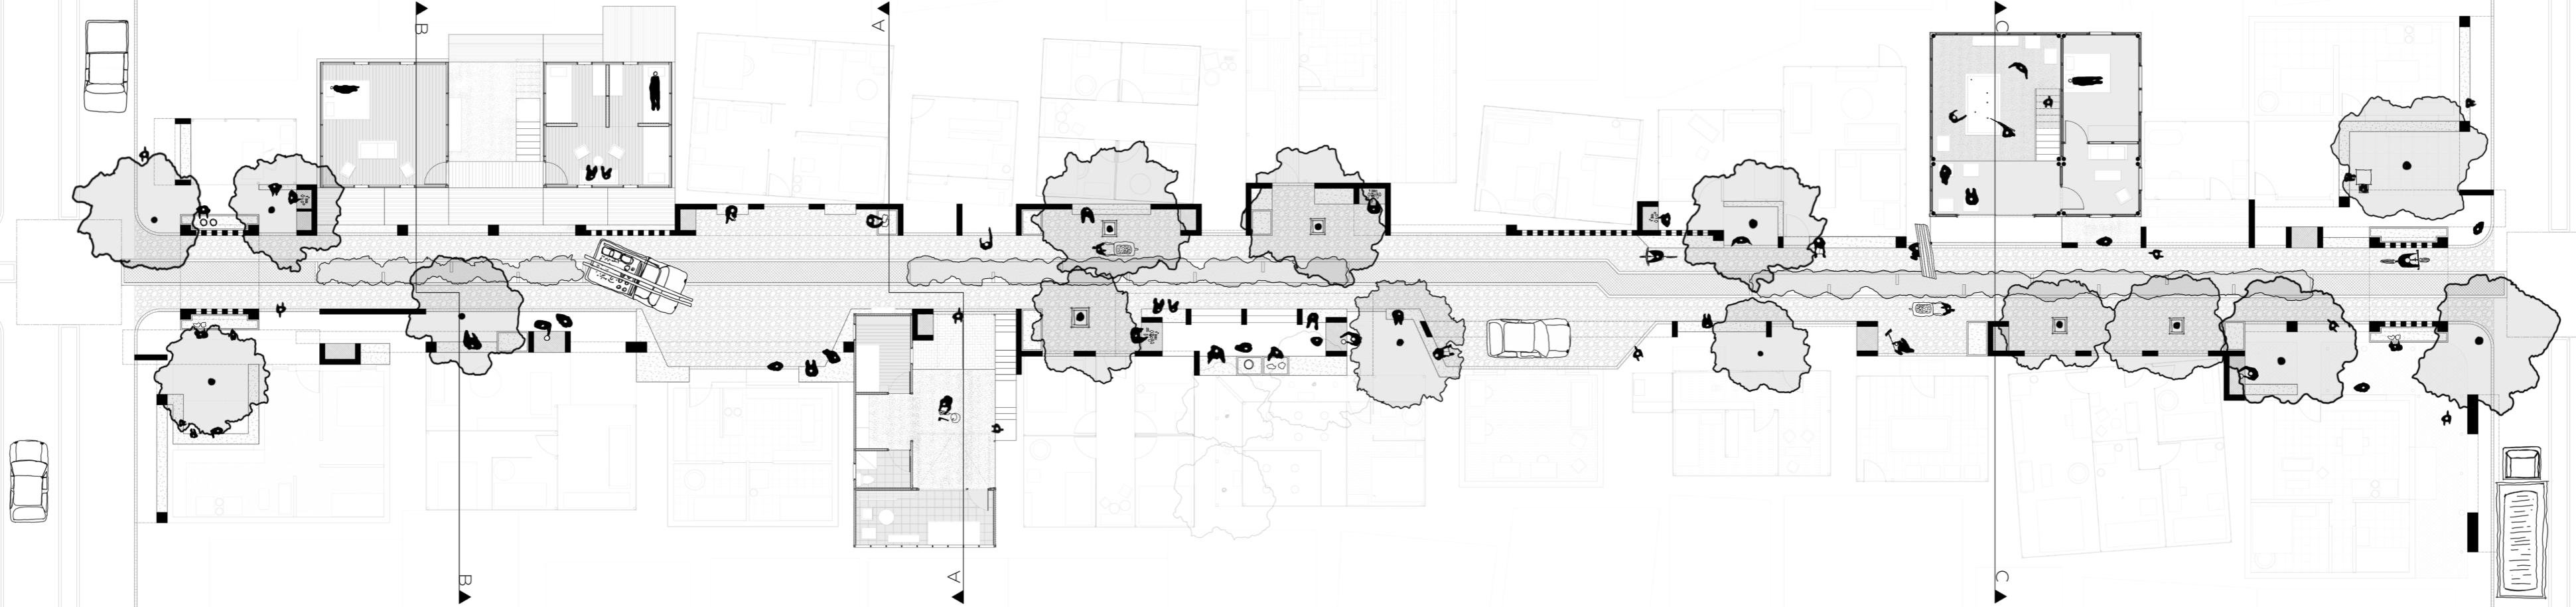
Phase 2 - First floor plan of Alex, Numsa & Roy's dwellings (Author 2022)
